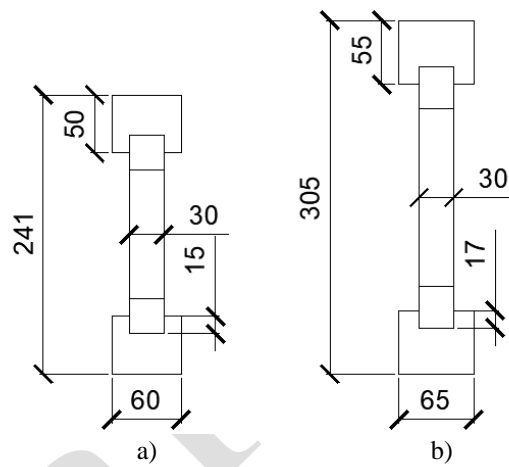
Section through I-joists, a) 241 mm deep I-joist, b) 305 mm deep I-joist (Dimensions in mm)
